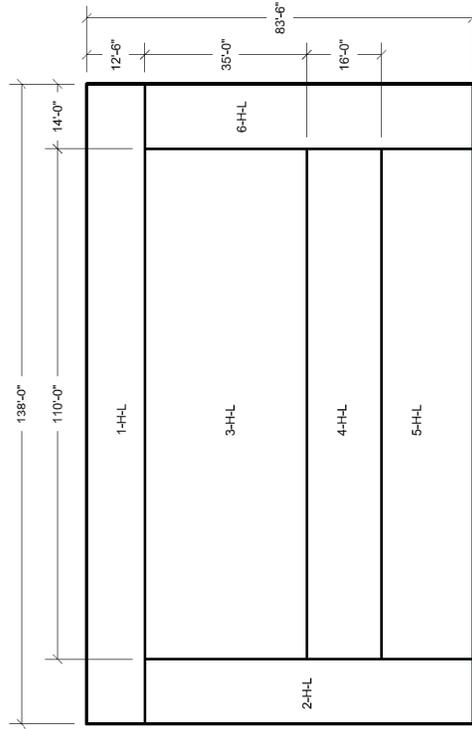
H.6-94: LHS BASIN EAST WALL LOOKING WEST
